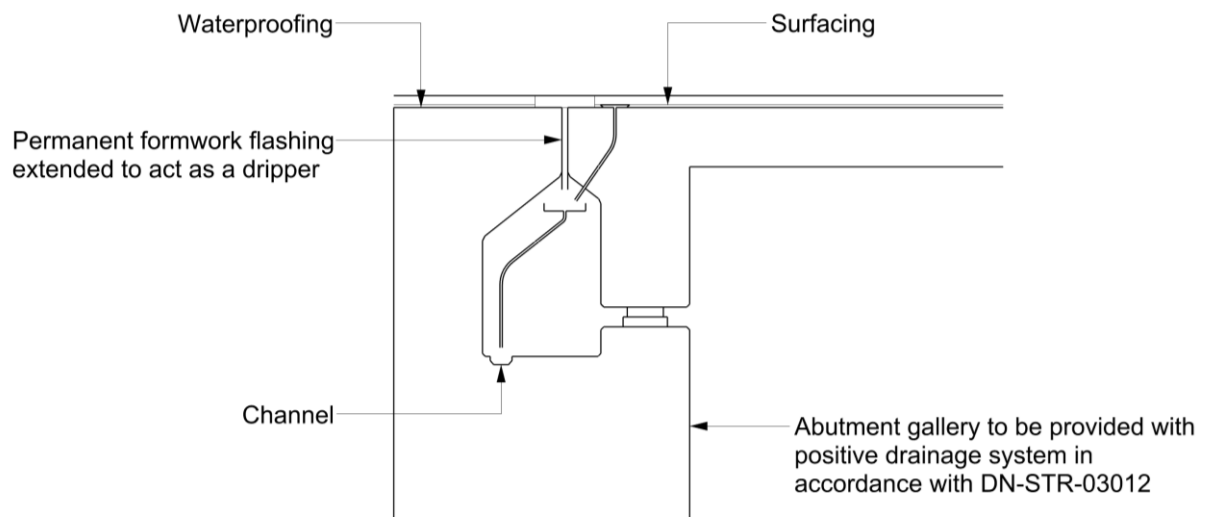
Section illustration for sub-surface drainage into the bridge abutment gallery
